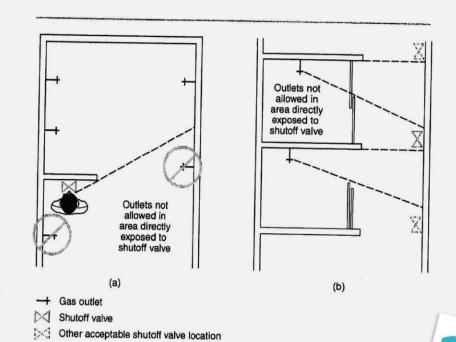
22 Zone valve box locations: (a) acceptable/not acceptable areas for locating a zone valve box; (b) other locations for locating a zone valve box. (Courtesy of Chad Beebe)
